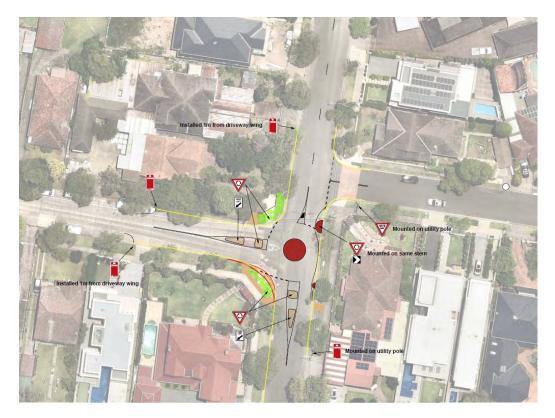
signage plan at the intersection of Barker Road and Chalmers Road
